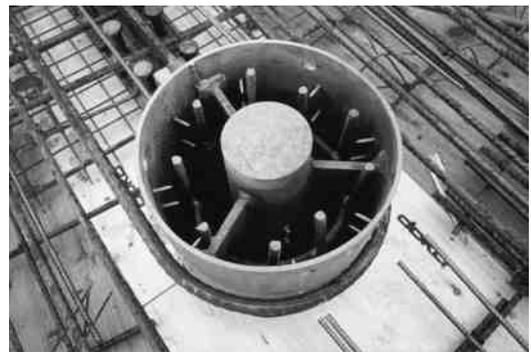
Example: Cross-section of a column in the Millennium Tower, Vienna
